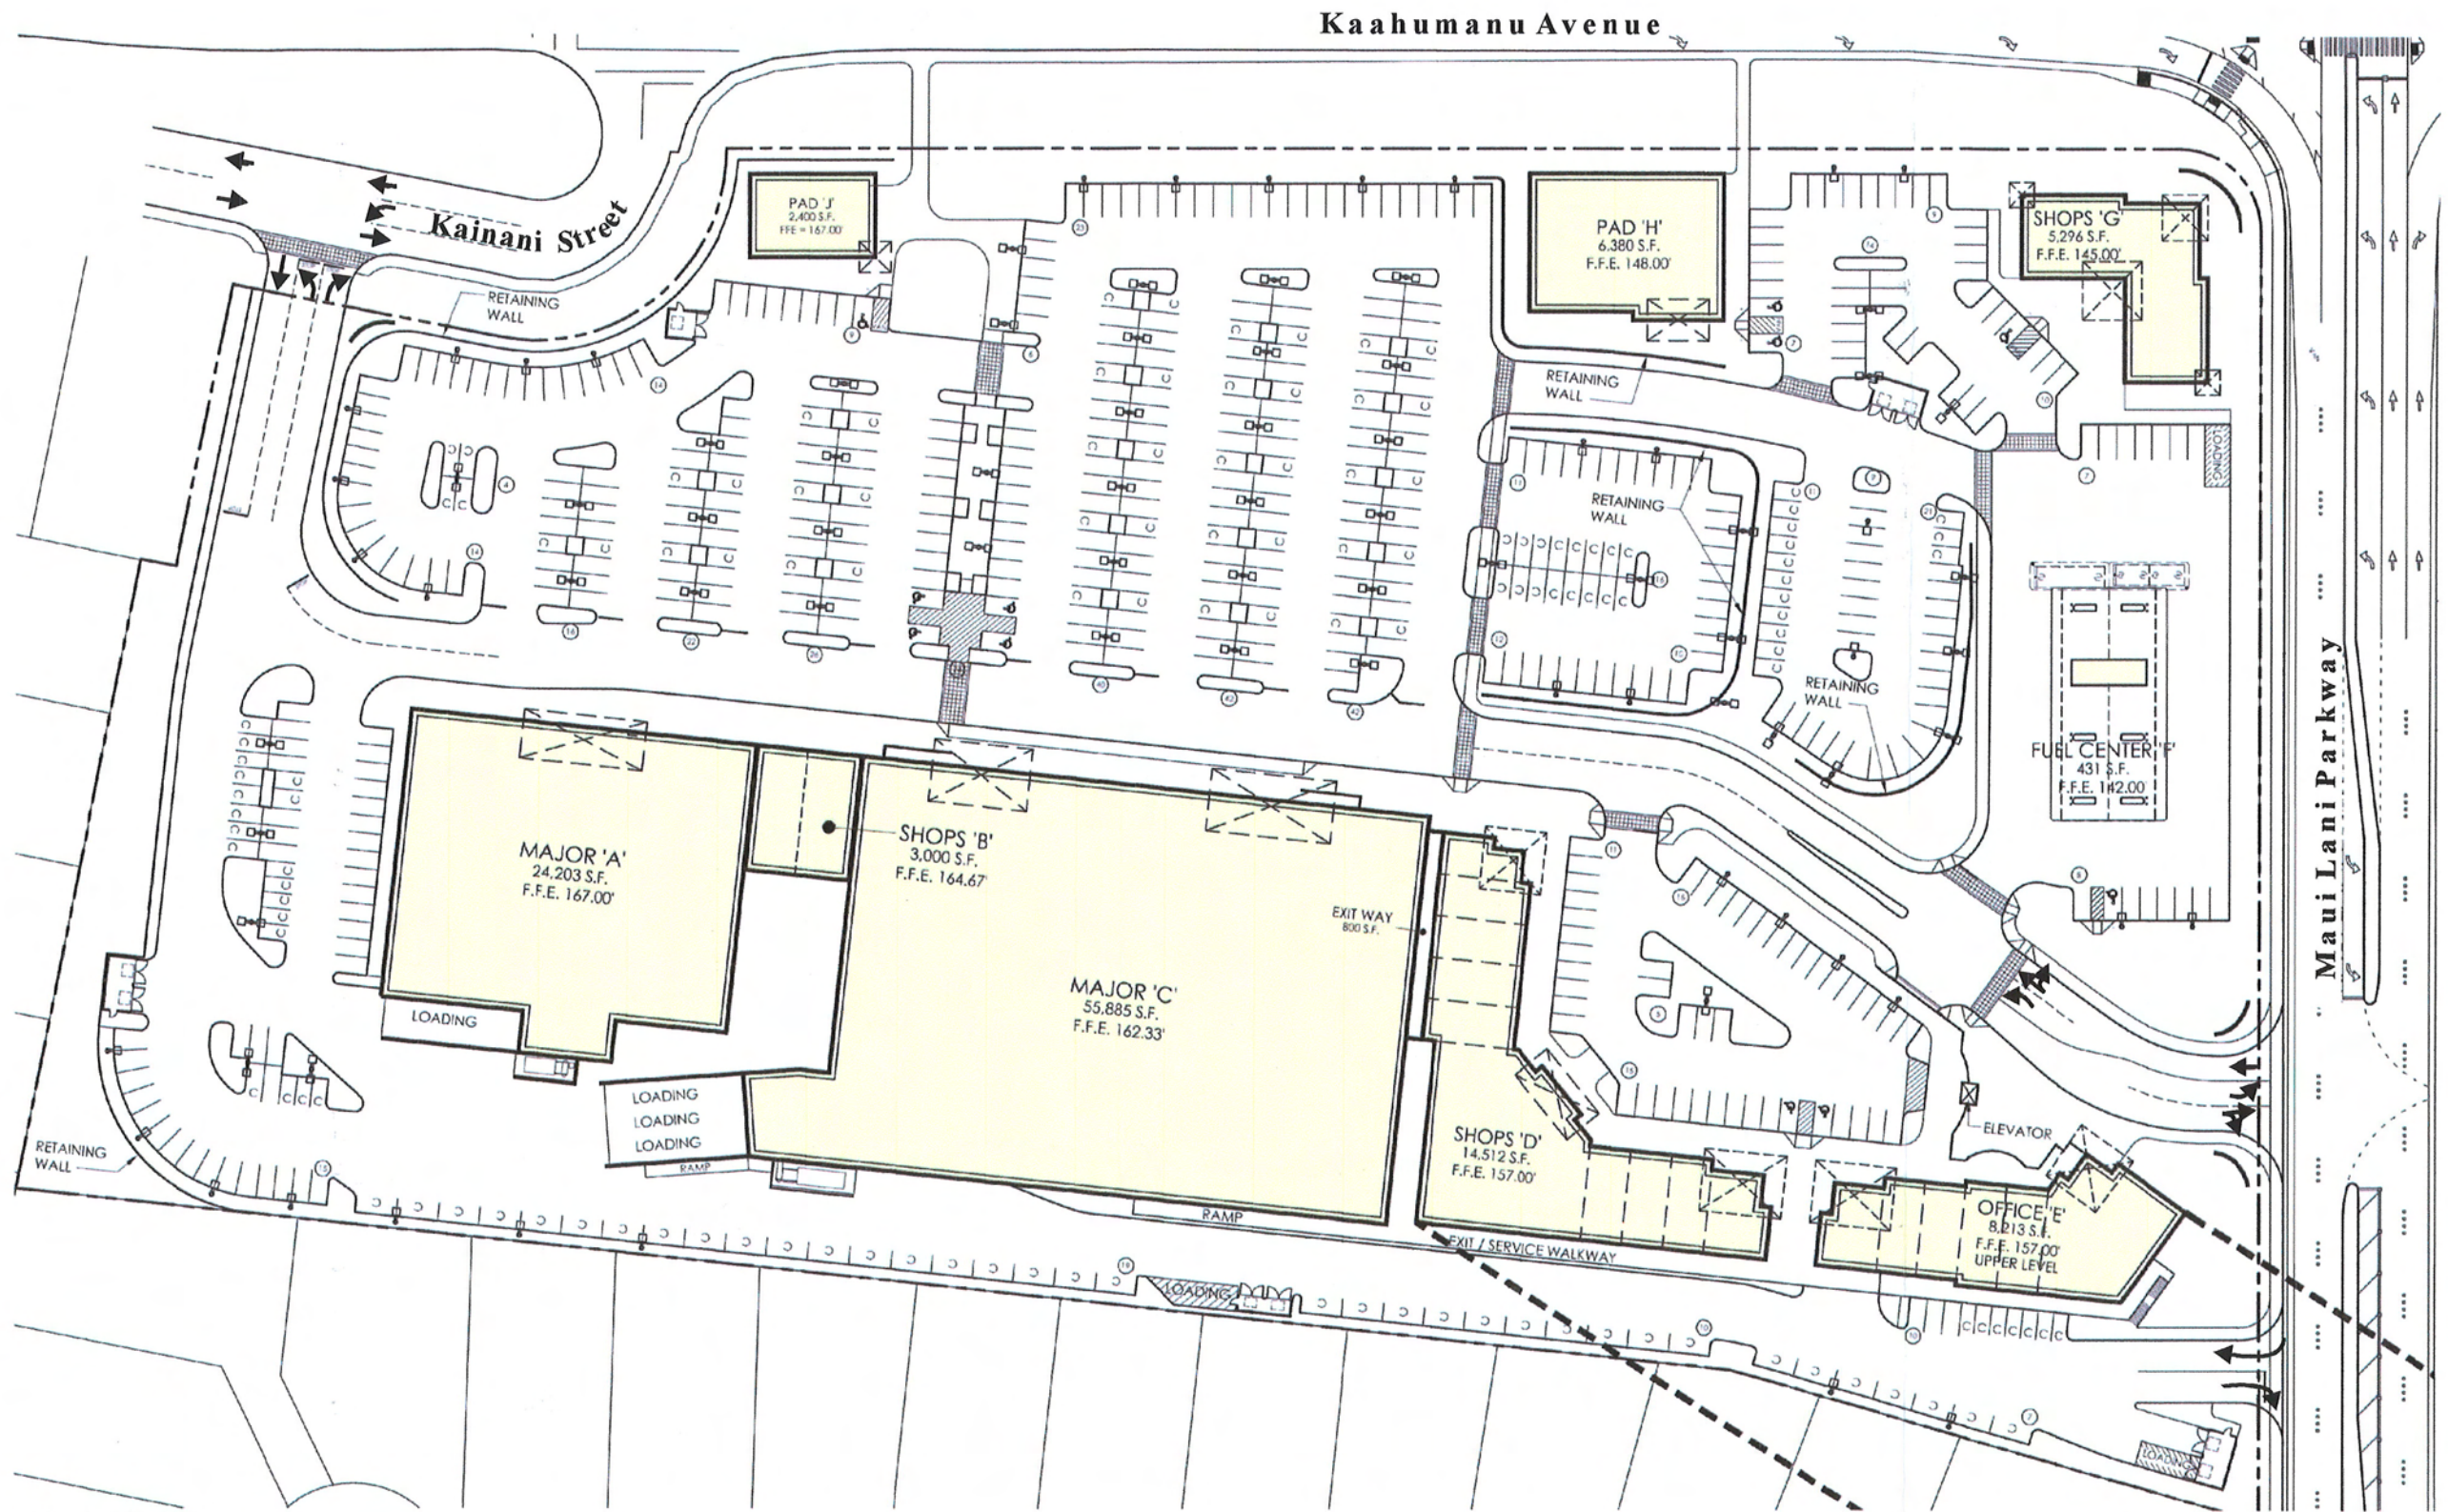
Proposed Maui Lani Shopping Center NOT TO SCALE
